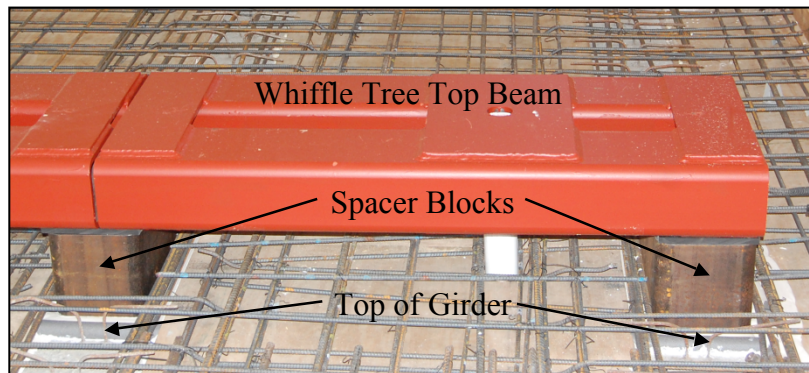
Details of Whiffle Tree Spacer Blocks and Top Beams
